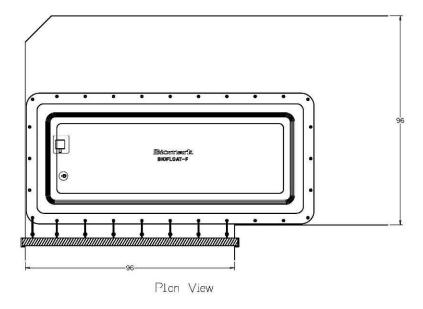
Plan view of 10' BIO Floating antenna at exit to BON AFF channel. First section of shade cover would need to be lifted up, from deck, to allow installation of the antenna.
